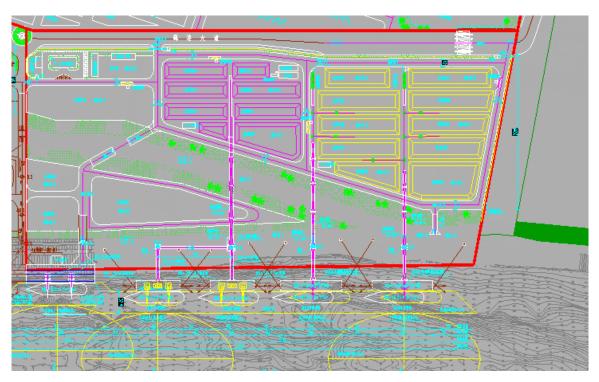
Layout plan of #7 ~ # 11 Births (Scenario I)
